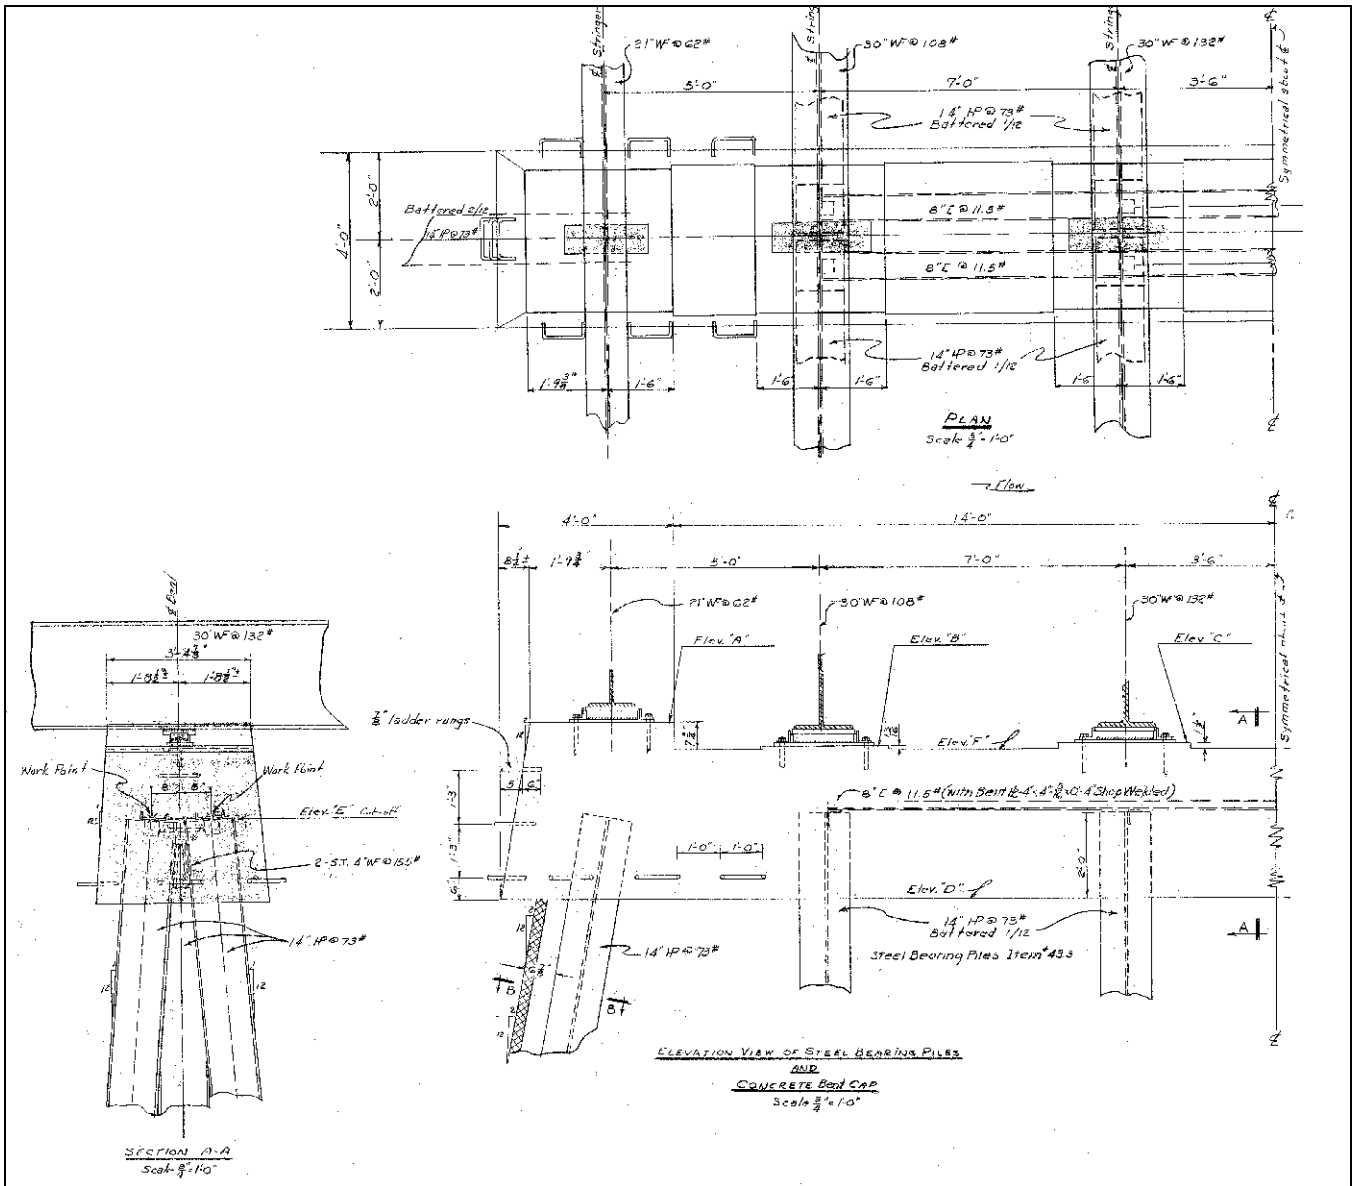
Plan, elevations and section of H-pile bent from original drawings (NHDOT File No. 3-4-3-5).
